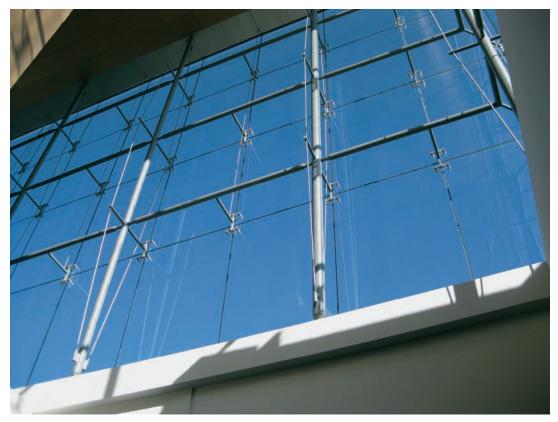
The basic facade structural system consists of alternating cable trusses and suspended horizontal outriggers.
